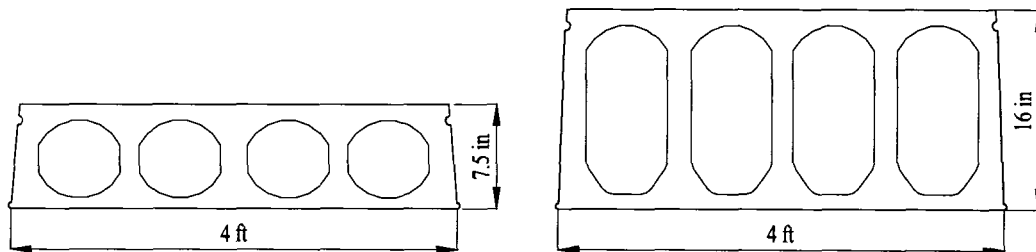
Typical cross-section of hollow core slabs in Yang's tests [3].
